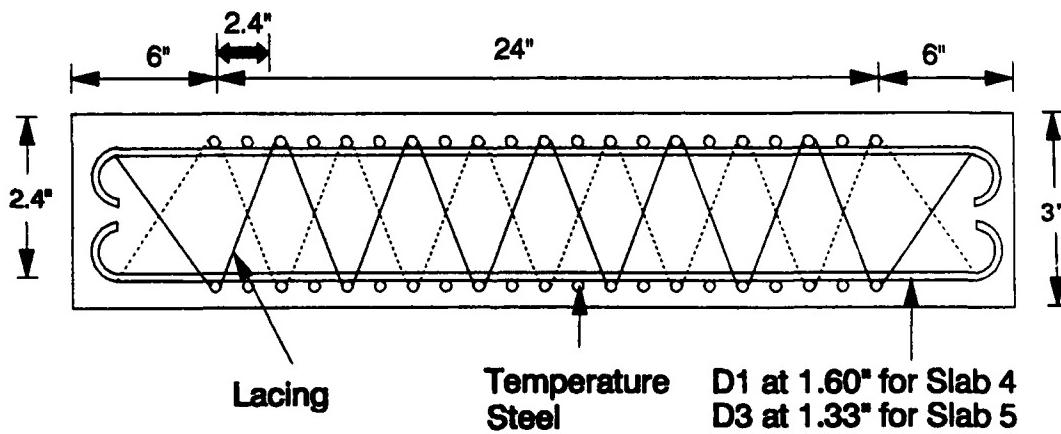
Sectional View Through Length of Slab Nos. 4 and 5
